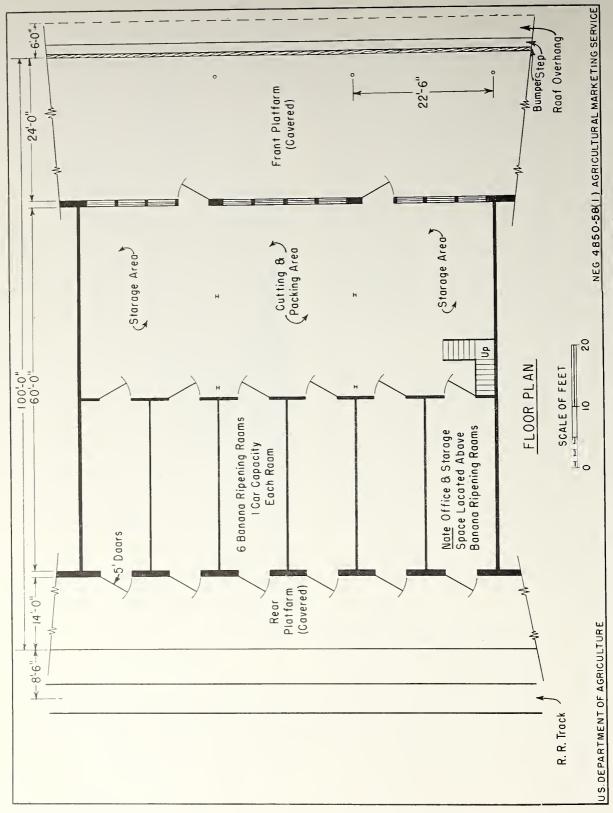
Possible plan, covering 3 standard store units, for the handling of bananas.
